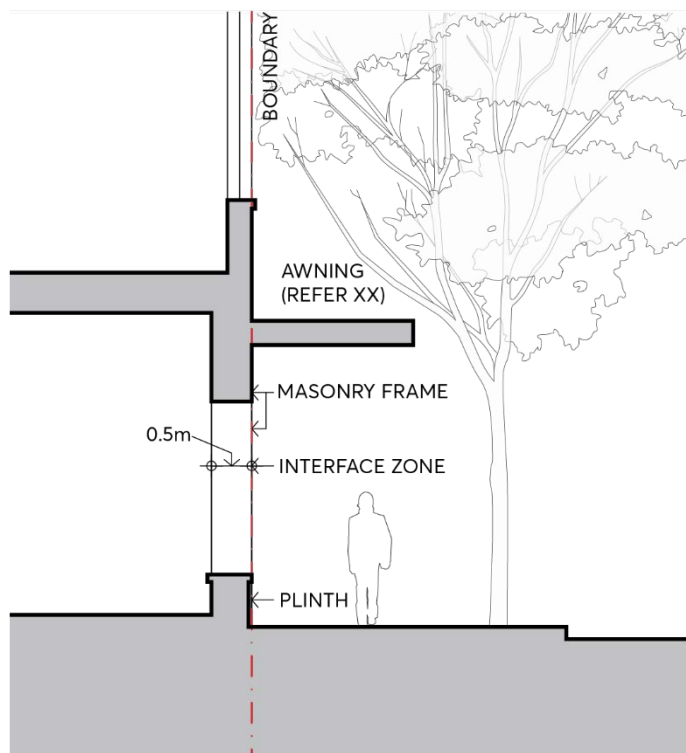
Active Ground Floor Frontage
